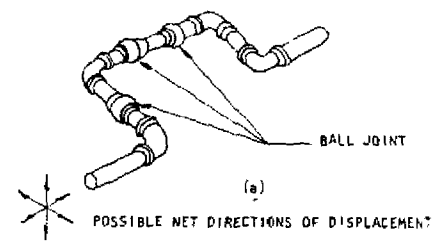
Piping systems. Piping and tubing at wall. Flexible allowances also applies to floor interfaces.
